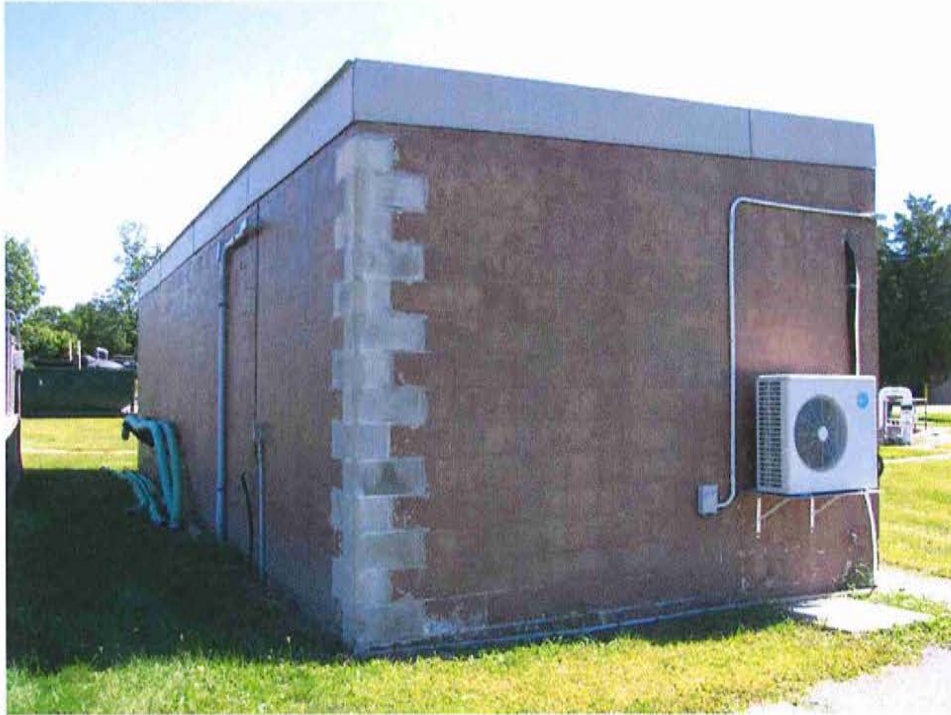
Intermediate Pump Station - View of repaired NW corner. Roof slopes down from right to left, permitting water to run down the face of the north (left) CMU wall.
